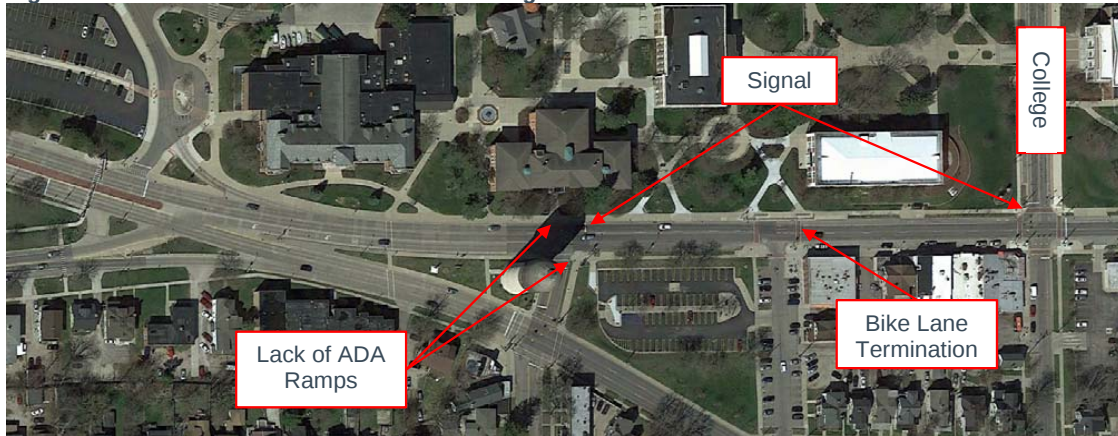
Aerial of Cross Street from College Place to Washtenaw Avenue
